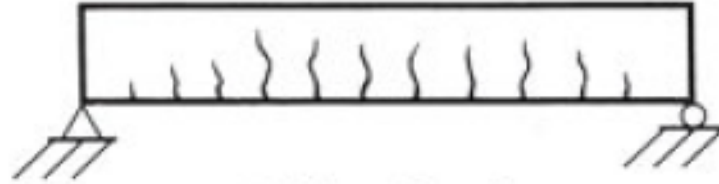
General outlook (non-strategic) view of flexural cracks on a simply supported reinforced concrete beam
